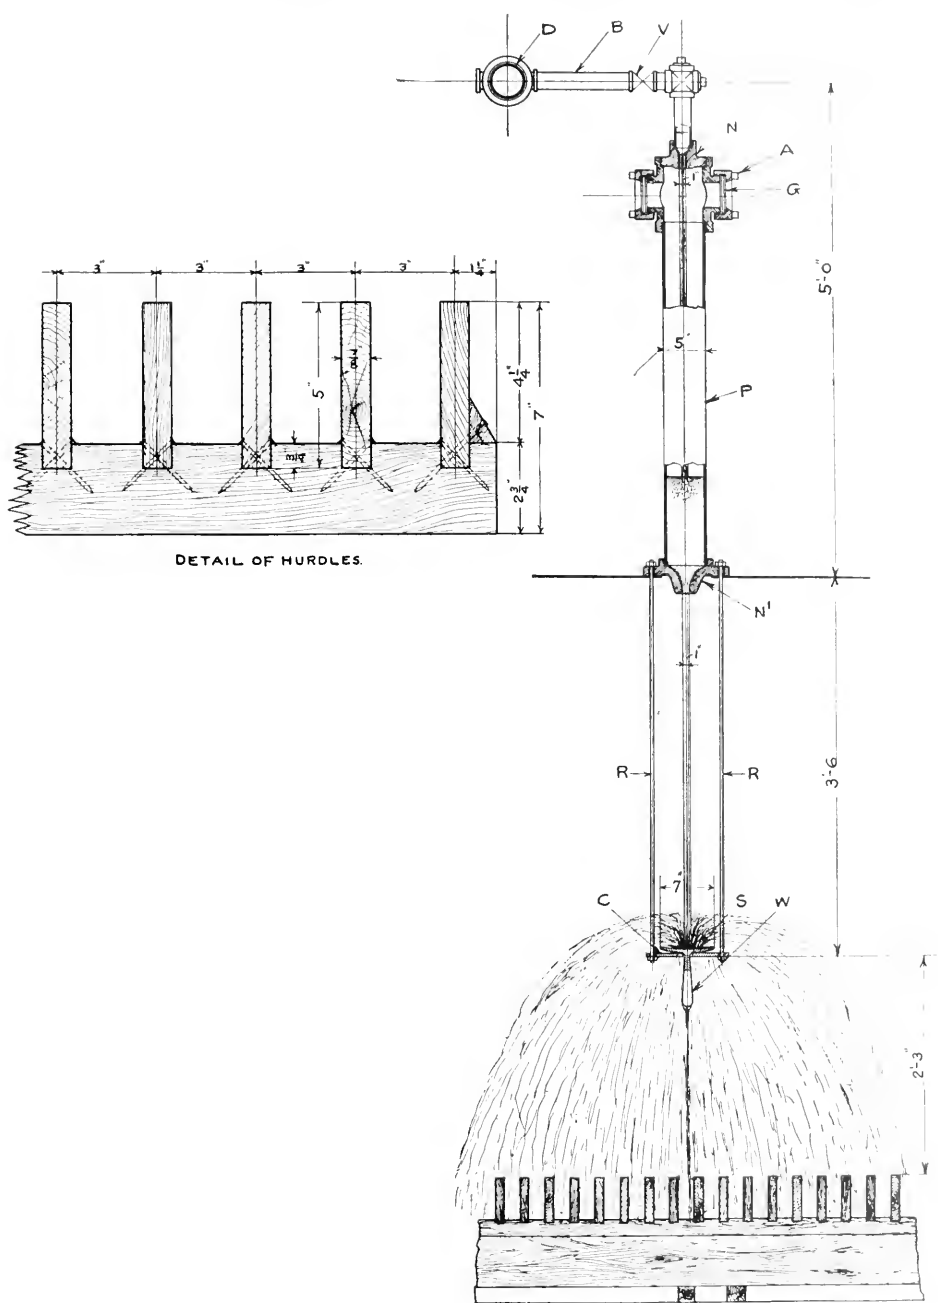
DETAIL OF SPRINKLERS AND HURDLES
